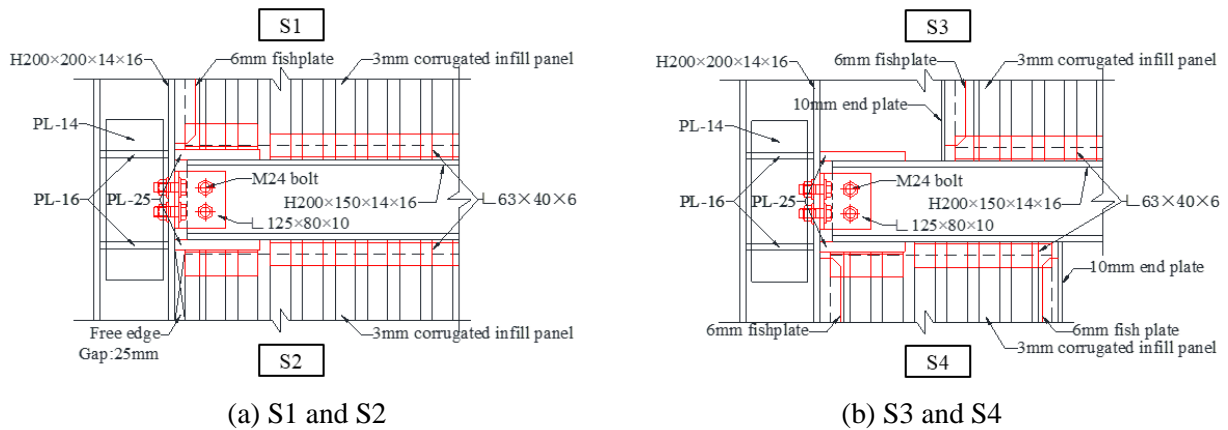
Details of beam-to-column and panel-to-frame connection in different specimens
